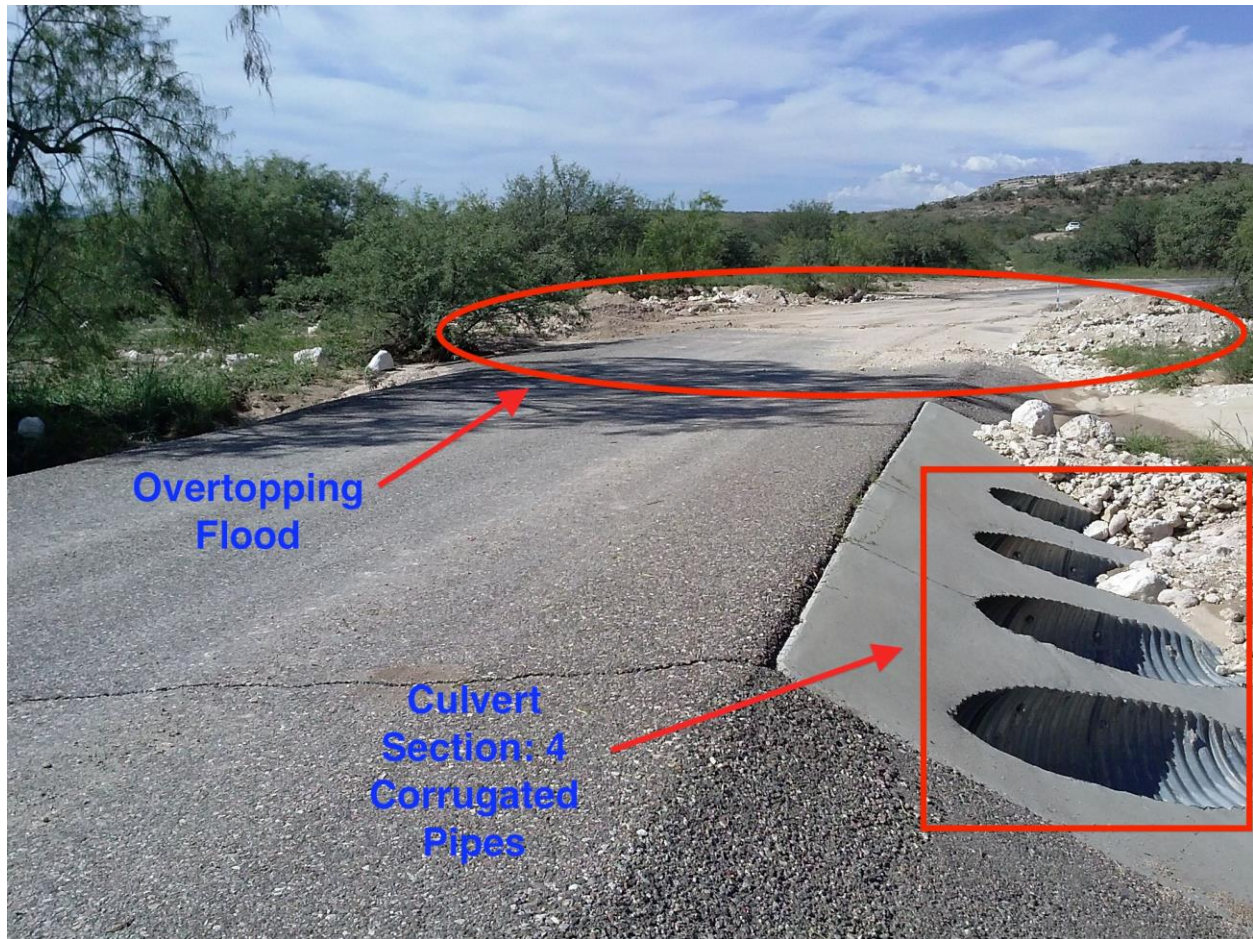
Existing Culvert (flow entrance) with Road Overtopping View
